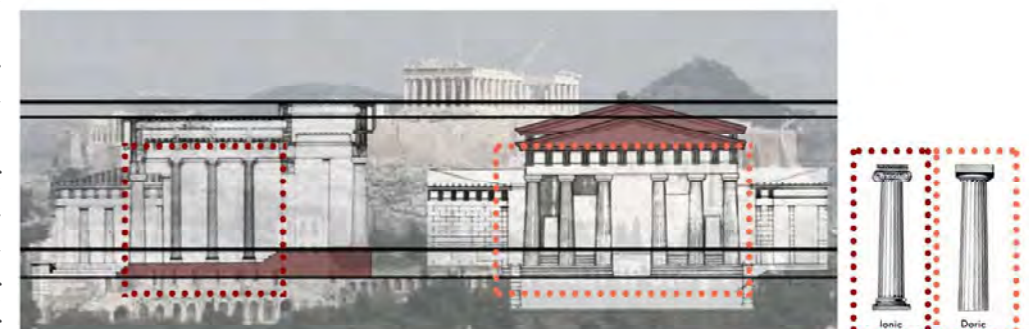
Above; Elevation of the Propylaea and use of columns (Author:2018)
